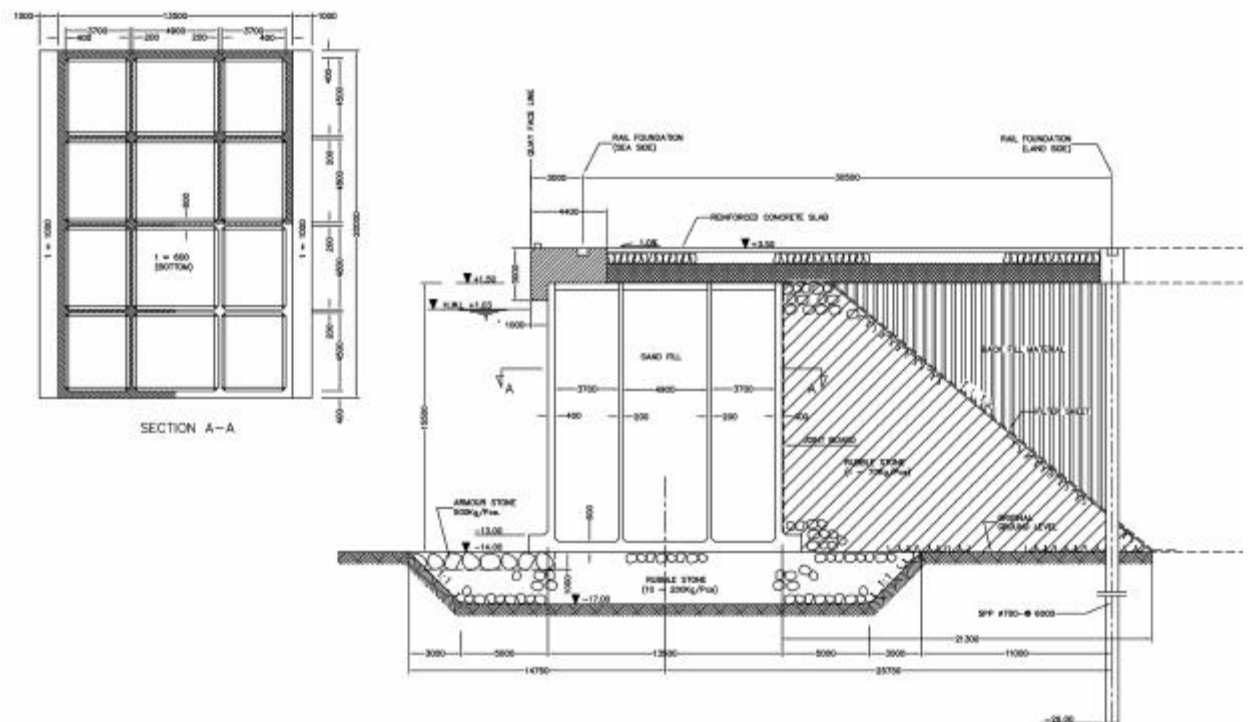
C-1 Bojonegara Quay Wall of Container Berth (Concrete Caisson, LWS-14 m)
